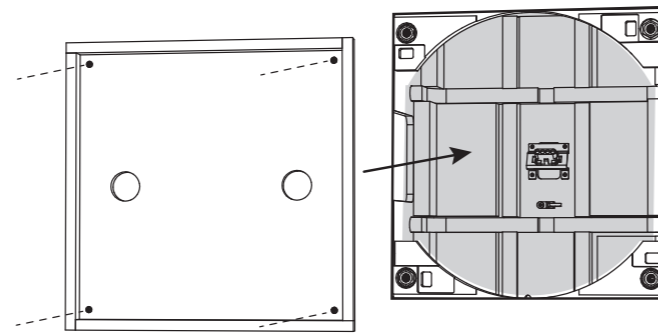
Drywall Removed from the Aperture, and Cover Installed
